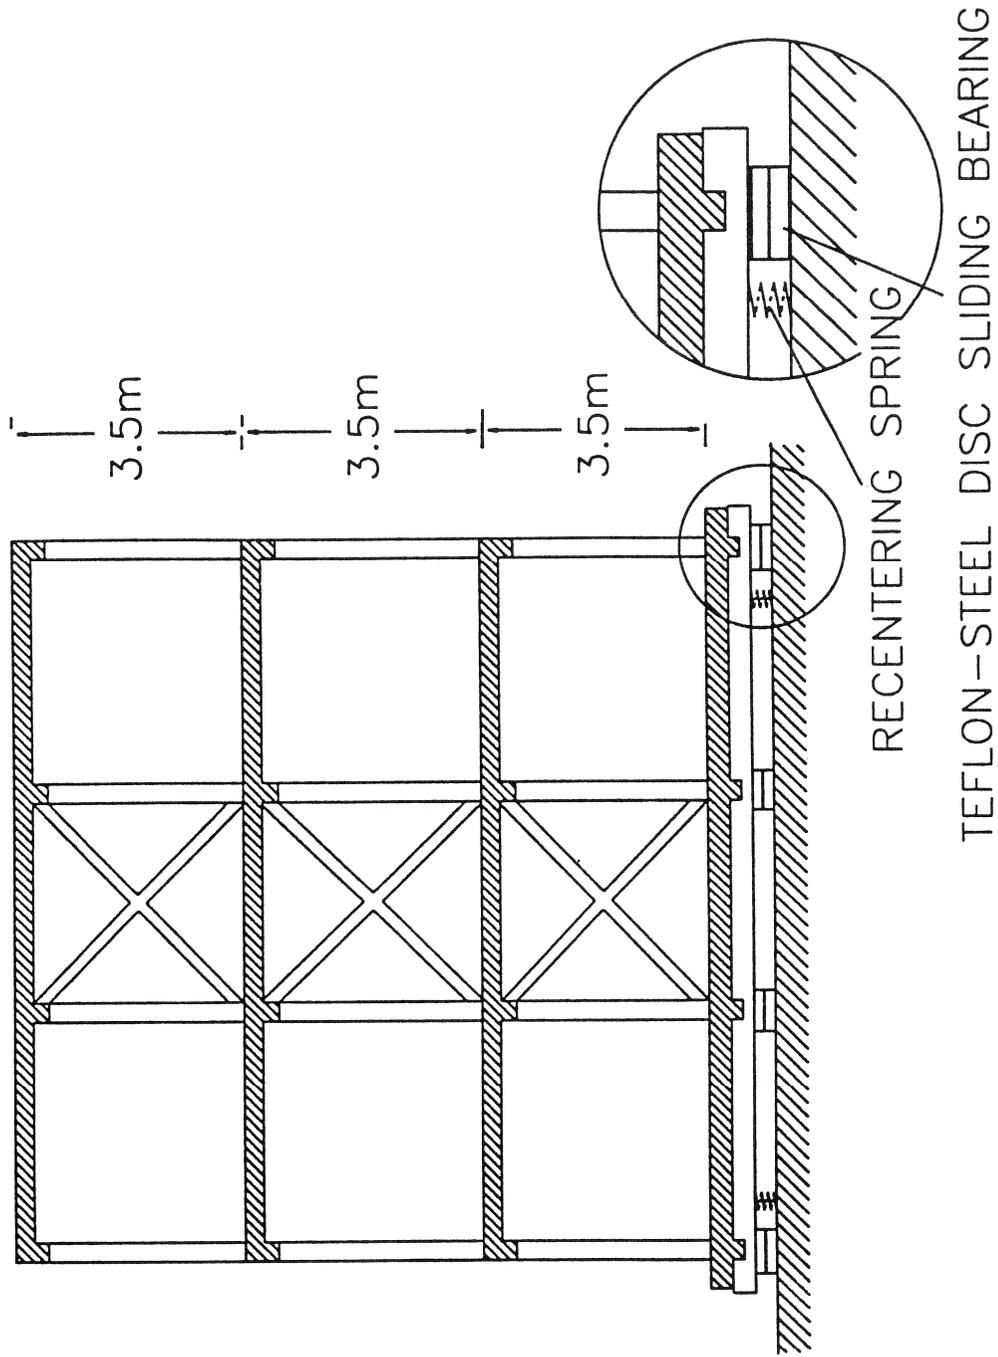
Cross Section of the Three Story Reinforced Concrete Sliding Isolated Building (Left Extreme Column Line is 16 and Right Extreme Column Line is 13). Note the Details of the Sliding Bearing and Recentering Spring Shown in the Inset and Plan Location Shown in FIG. 4.3.
